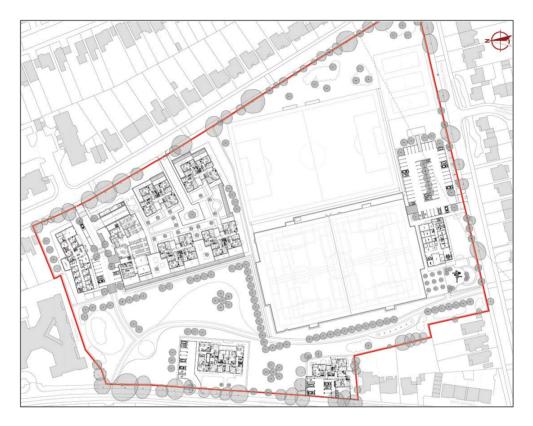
The Proposed Development Site Plan (Quantum Group Proposed Site Plan- Ref. 900-SK02)
